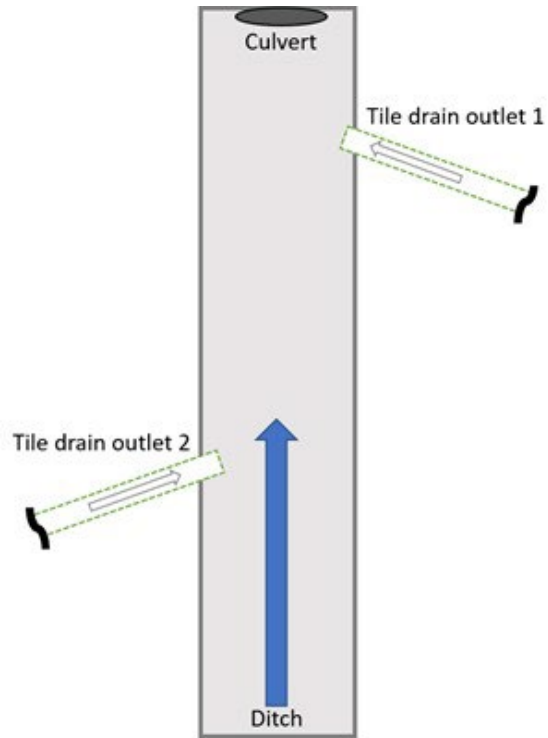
Plan view of the existing conditions at the study site. Two tile outlets discharged into a central ditch.
